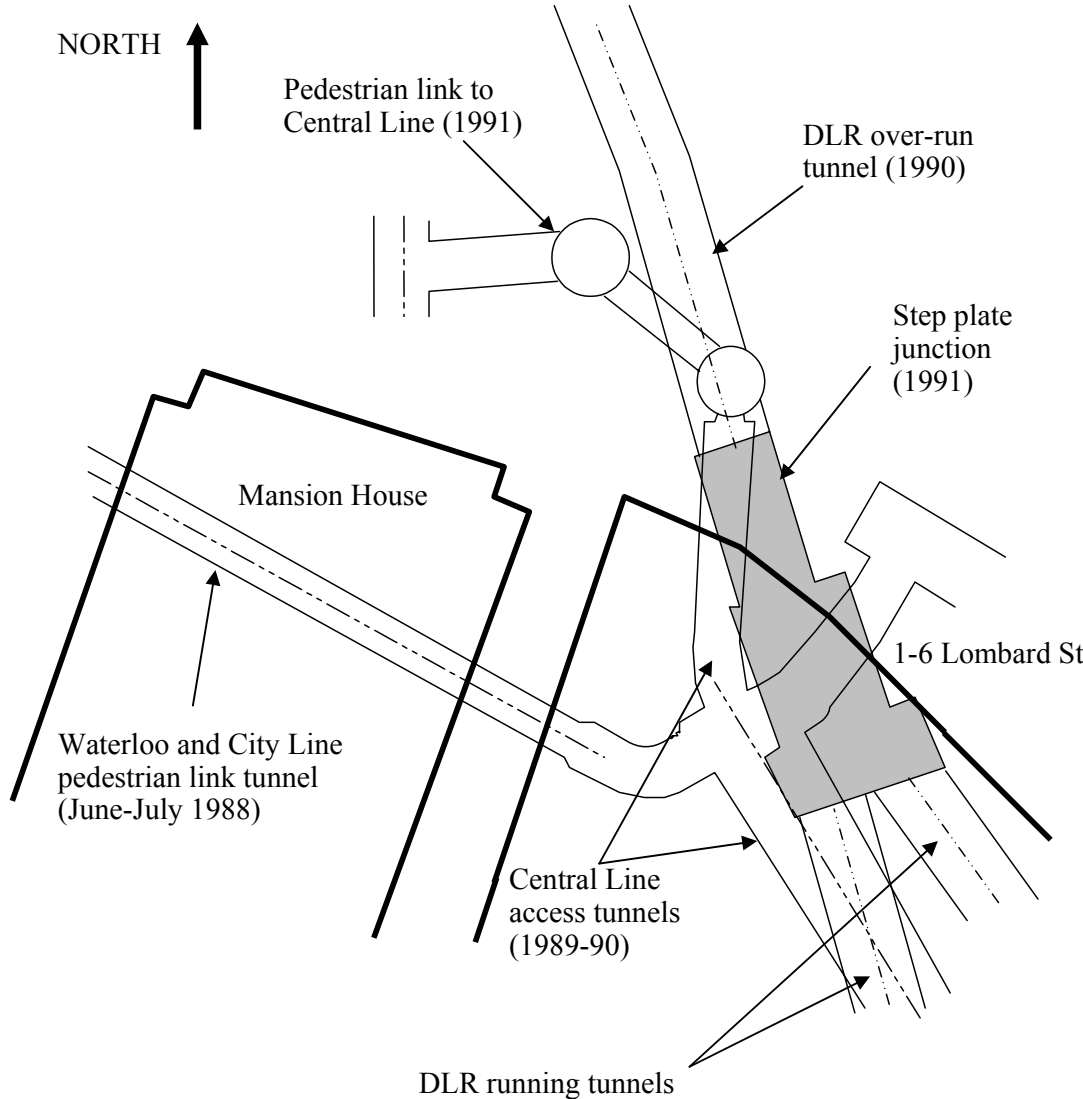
Key plan of the Mansion House site showing tunnelling operations
